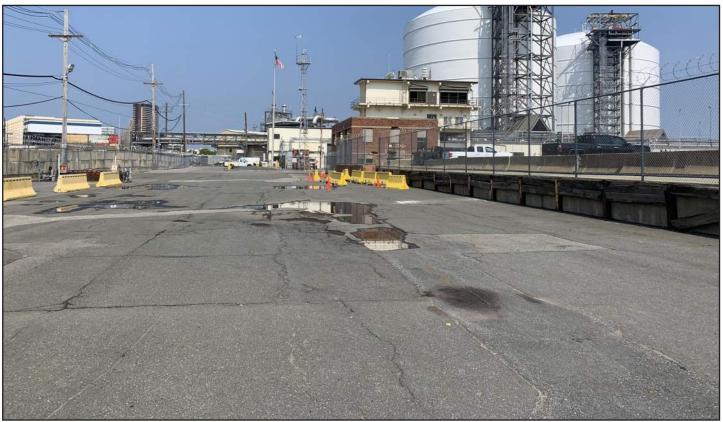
View looking south towards Mystic River and Rover Street, along Commercial Street
